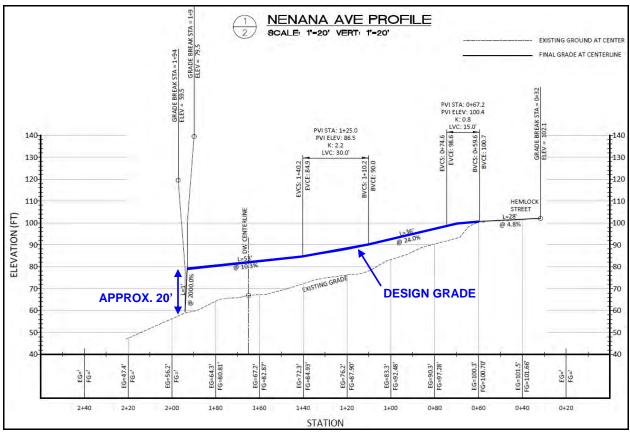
Proposed Nenana Avenue slope profile (base drawing source: Sheet 2 of Morgan Civil Engineering's 5/19/20 drawing set).
